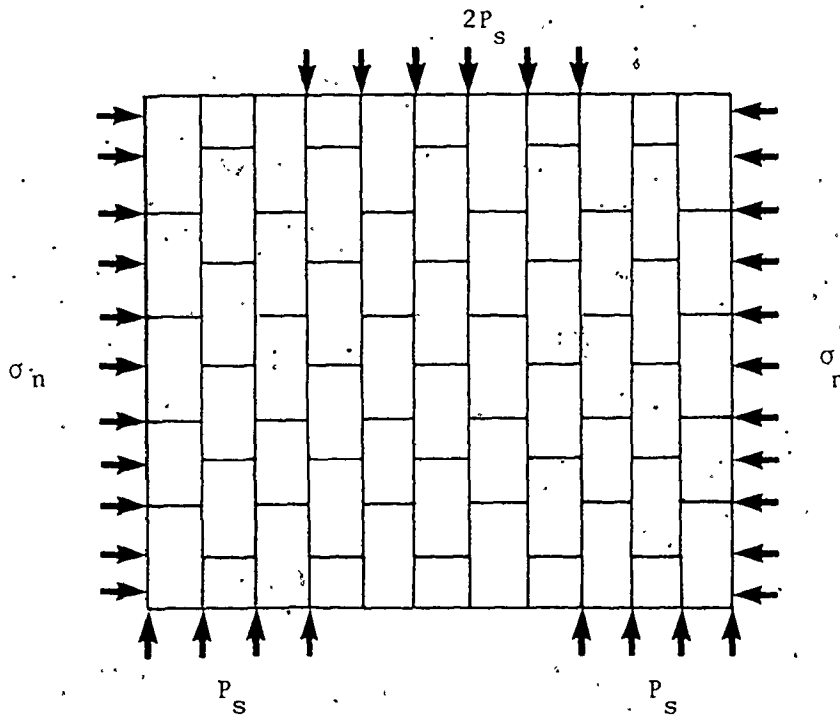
TEST SPECIMEN ADOPTED BY HALLER (18)
